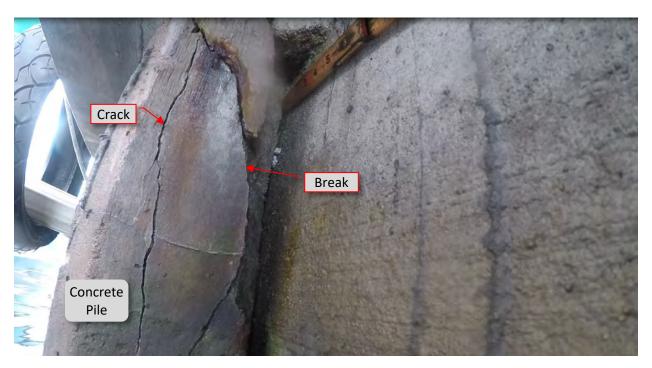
P36. STA 5+48. Cracks/spalls at both flanges at pile and loss of concrete. View of east flange.
